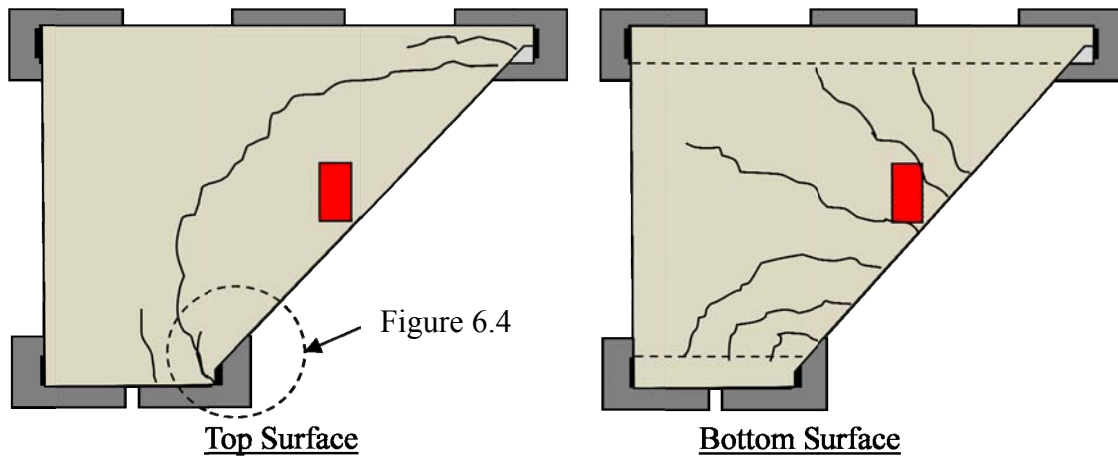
Observed Crack Pattern at Failure of Specimen 5
